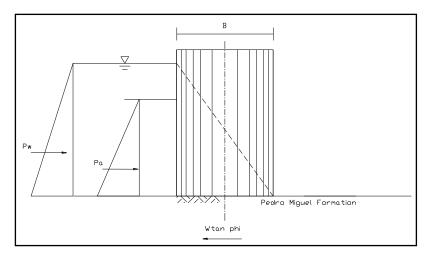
Horizontal pressure components acting on the cofferdam during the construction stage (static loading)
